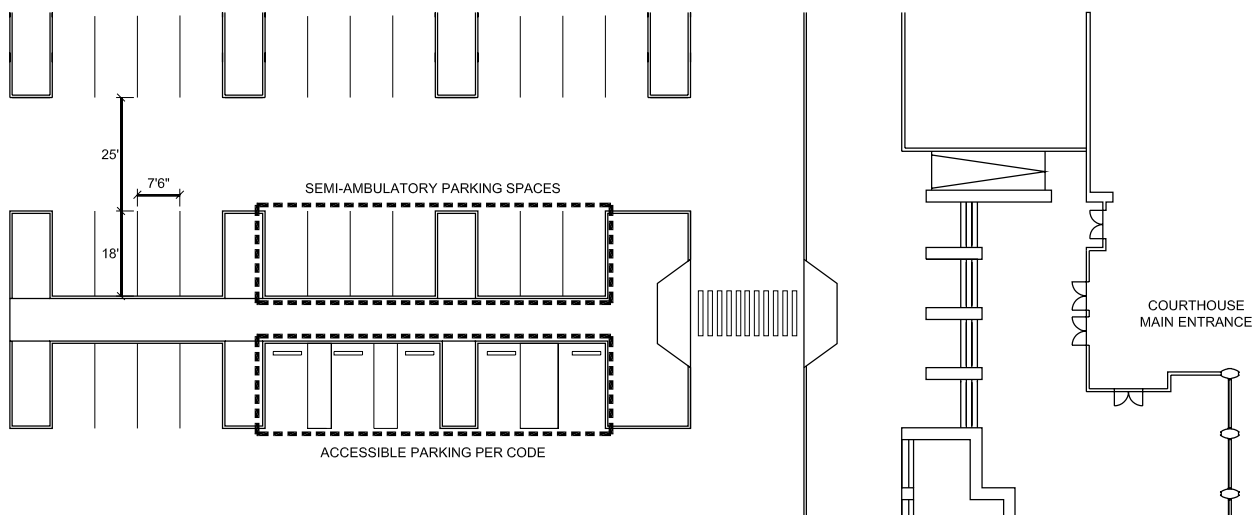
Parking Layout Showing Location of Accessible and Semiambulatory Spaces
